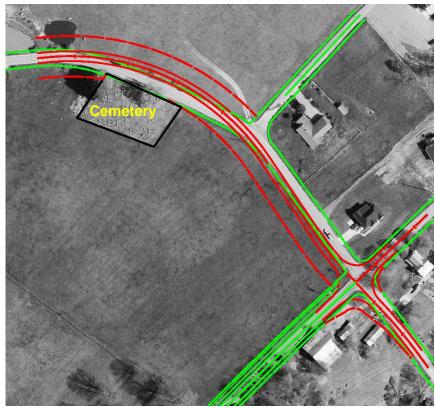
Plan View of Rock Springs Drive Intersection with Rock Springs Road
